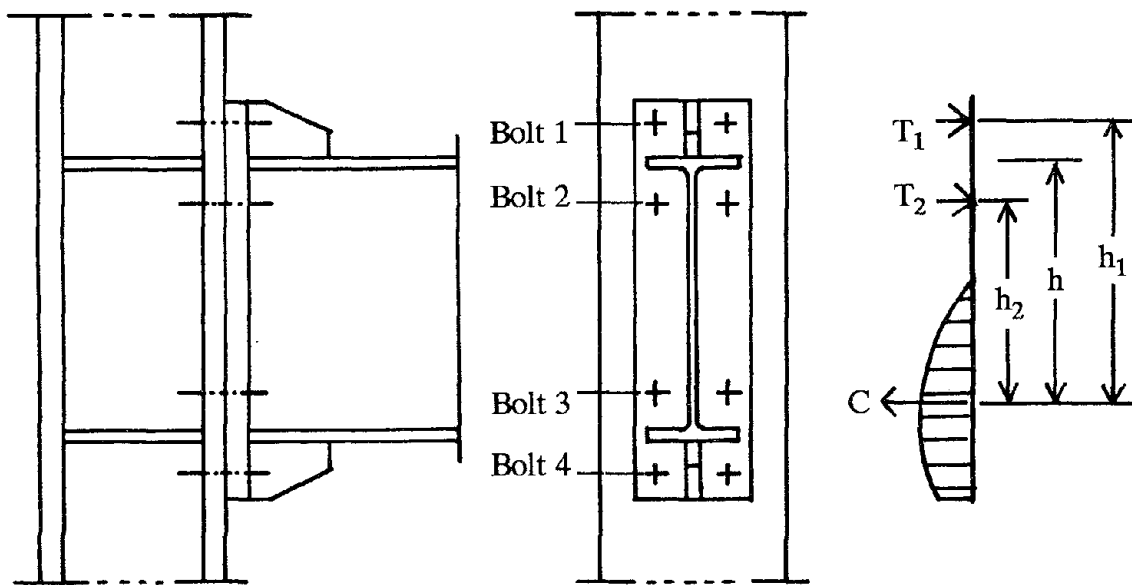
Bolt Gauge and Location of Gauged Bolts
